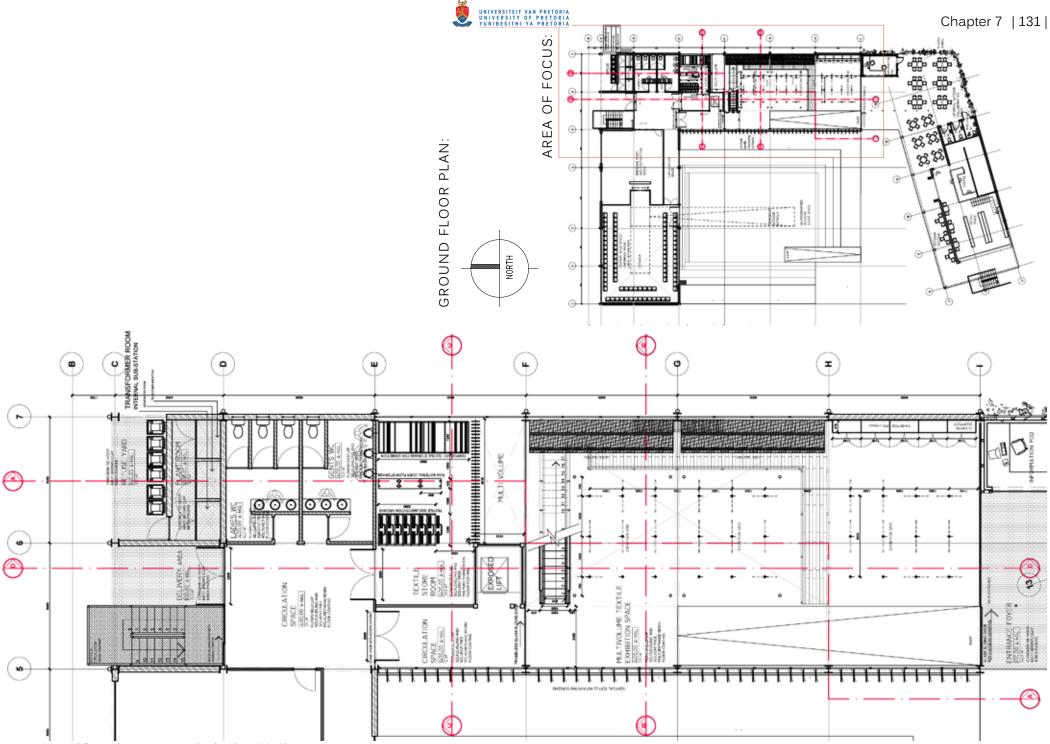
Ground floor plan. Not to scale. (Author, 2012)
